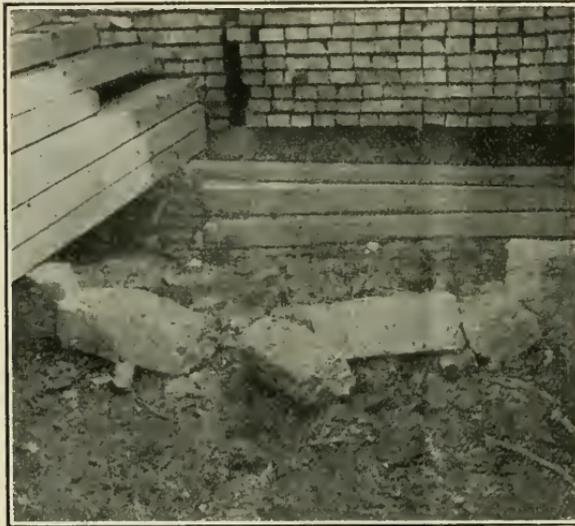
Concrete foundations in the retail yard in Alabama shown in figure 15.
